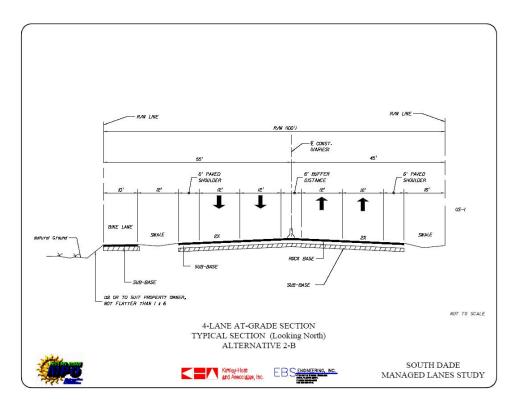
Typical Cross Section of the Four-Lane Alternative
